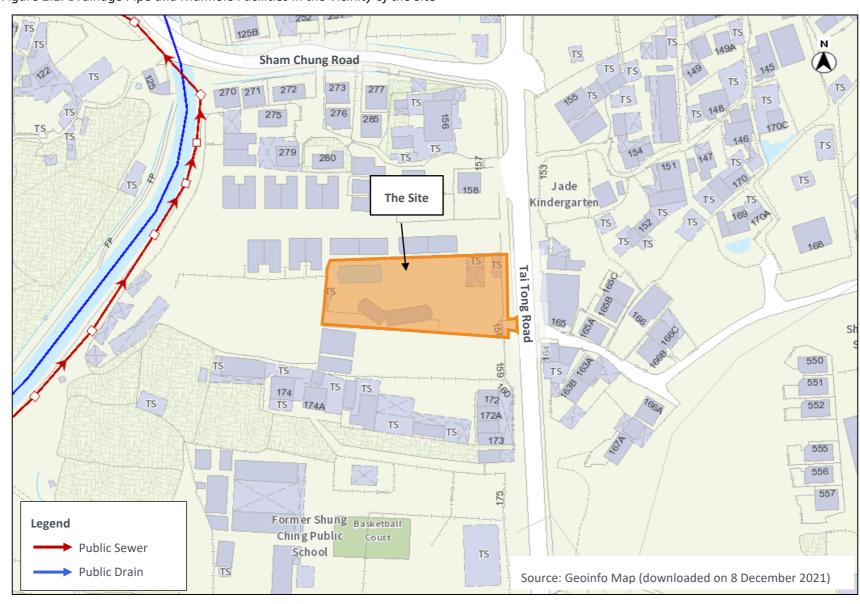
Drainage Pipe and Manhole Facilities in the Vicinity of the Site
